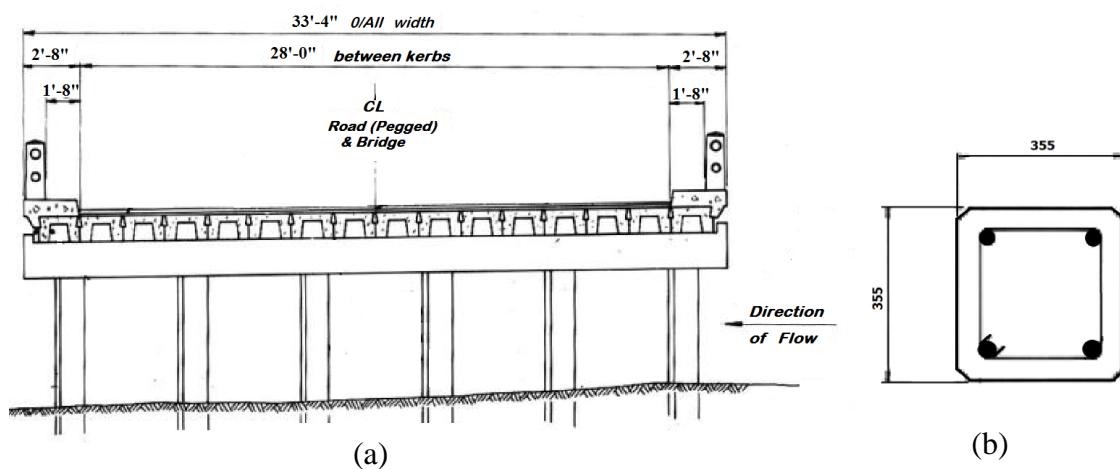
(a) A typical U-slab bridge section constructed in Victoria, (b) The U-slab pier cross-section
